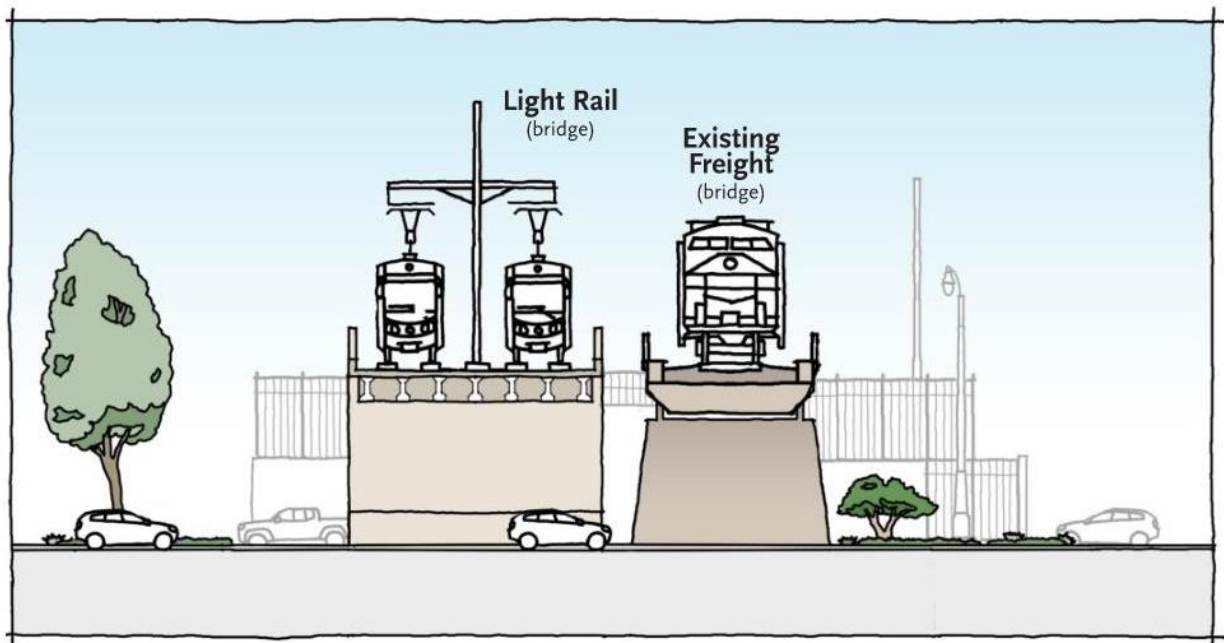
Locally Preferred Alternative – Looking South of 170th Street
